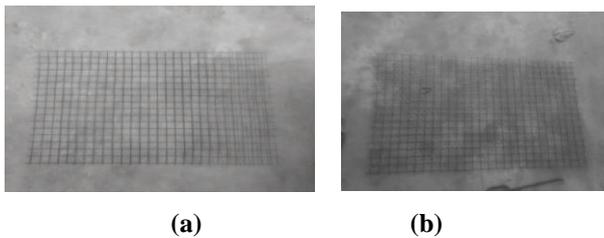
(a) Weld mesh (b) Weld mesh with 2 layers of chicken mesh
